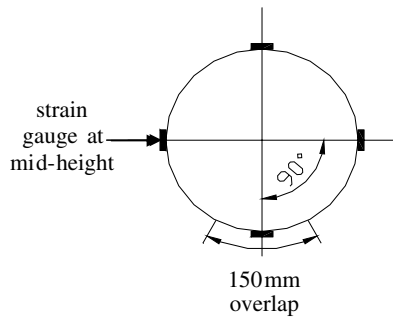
Layout of strain gauges for FRP-confined steel tube specimens.
